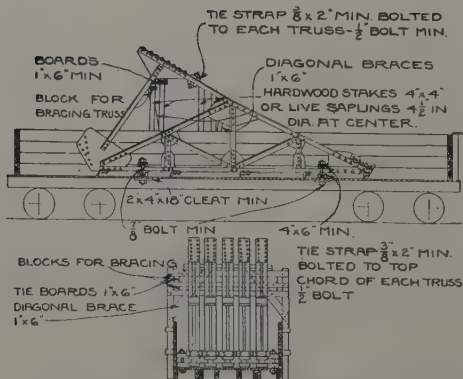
LOADING OF STEEL HALF ROOF TRUSSES.
